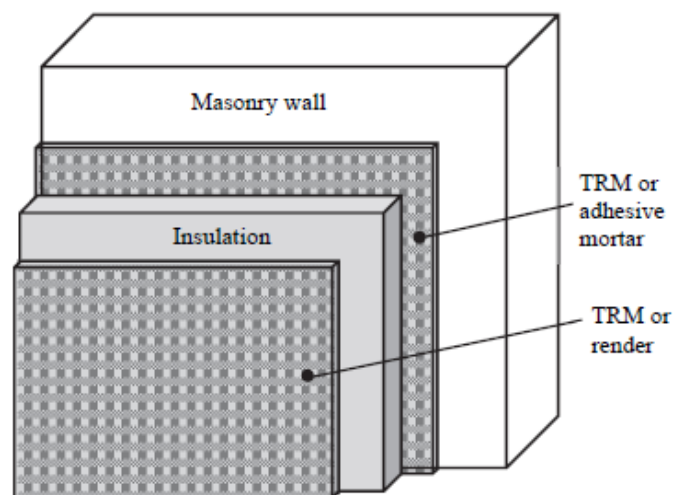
Schematic view of proposed structural and energy retrofitting system on one side of the masonry wall
